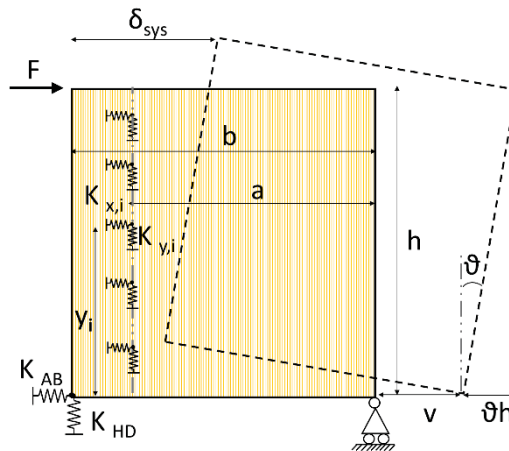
Mechanical system of CLT shear wall connected to a perpendicular wall.
